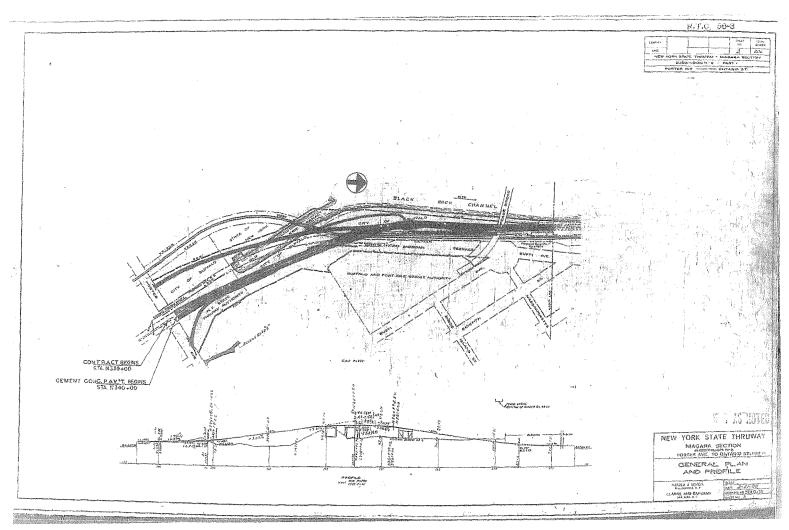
General Plan and Profile Sheet No. 3, New York State Thruway, Niagara Section, dated 3-21-55.
